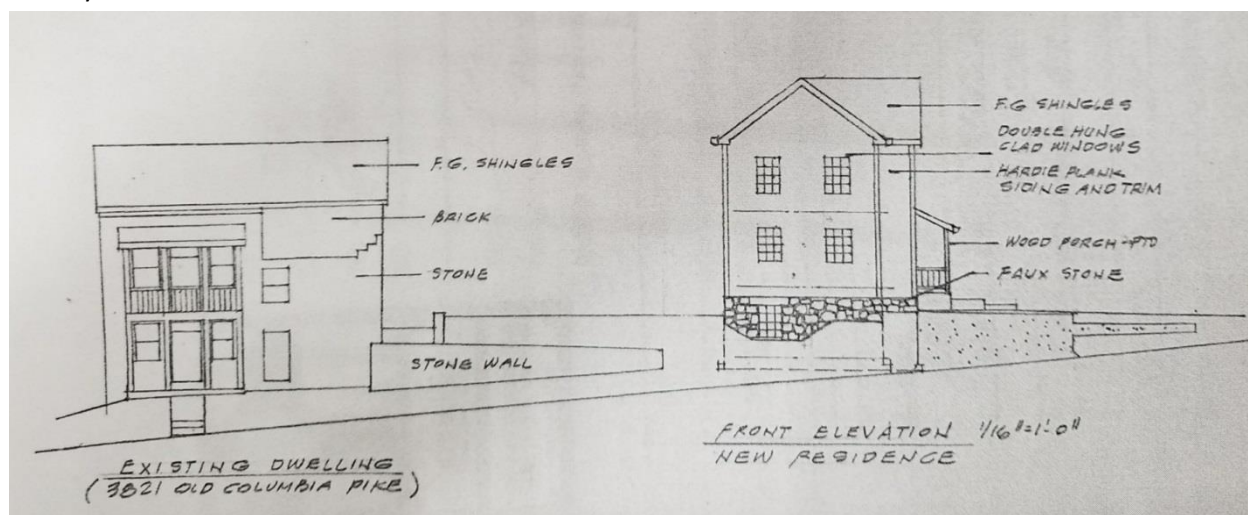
Drawing shows proposed streetscape with existing and proposed house
